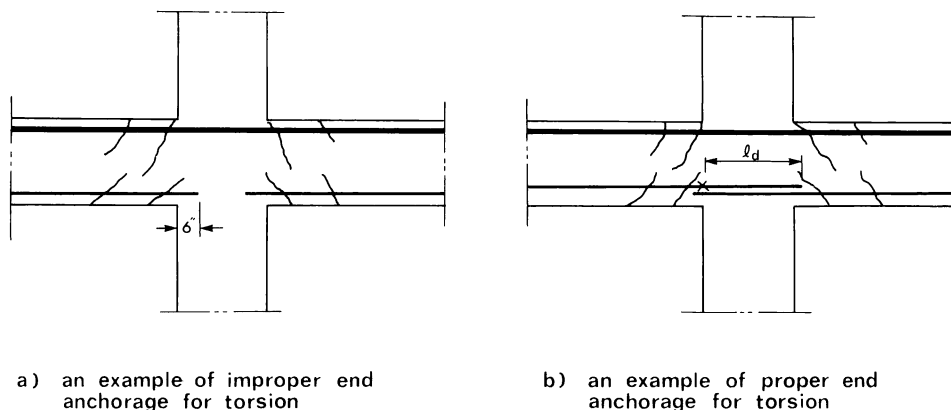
End anchorage for torsional longitudinal steel in spandrel beam. (1 in. = 2.54 cm)
